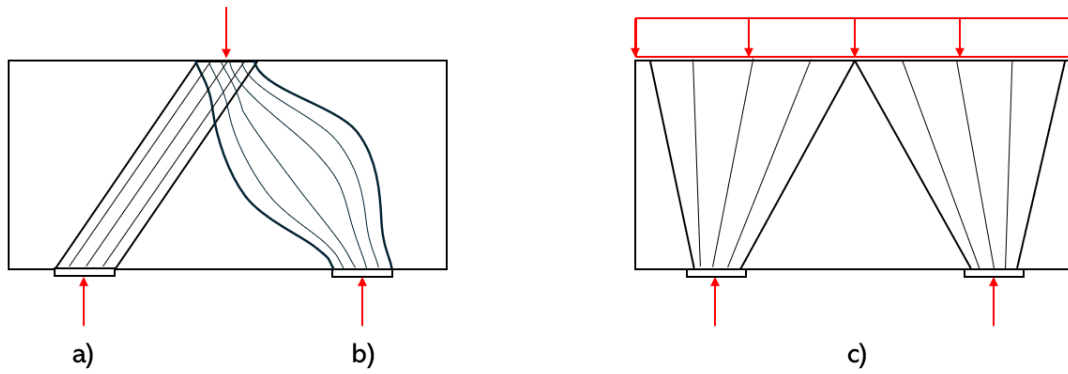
Strut shapes: a) Prismatic, b) Bottle, c) Fan.
